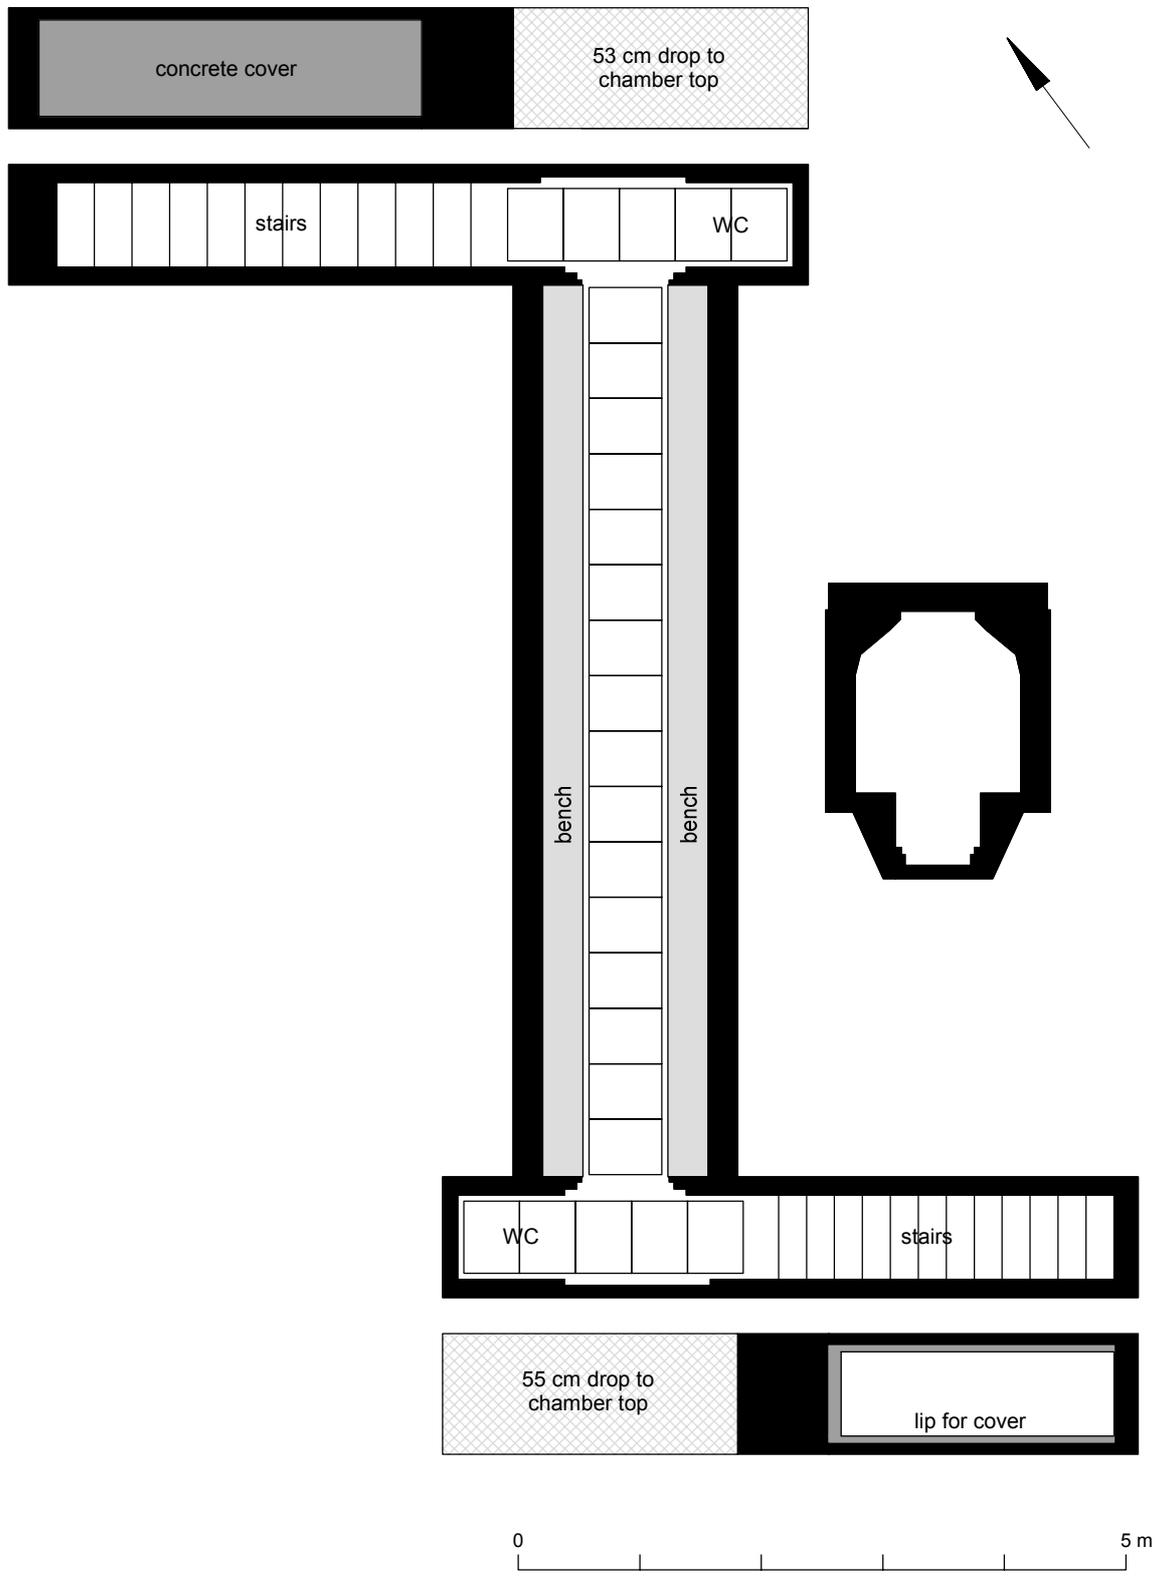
Area J1, air-raid shelter F8: internal plan and cross-section of chamber.
